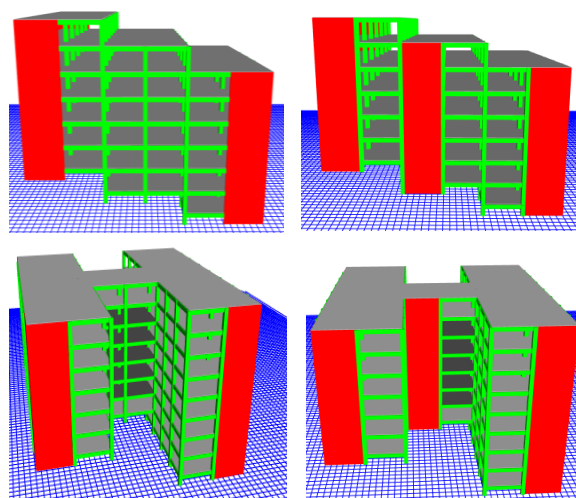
Elevation of H Shape Structure & Step Back Set Back Structure
